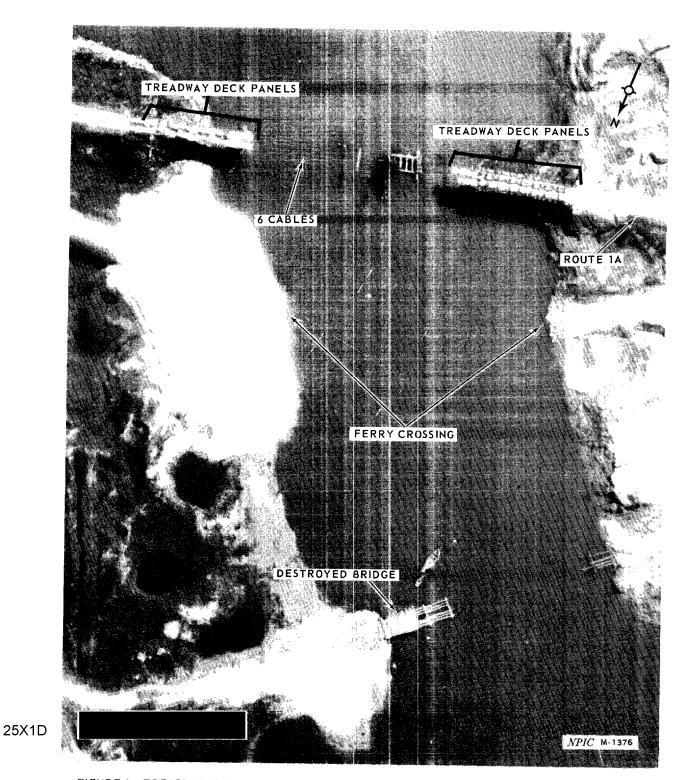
TREADWAY CABLE BRIDGE OVER THE SONG RAC. HA TINH AREA, NORTH VIETNAM
